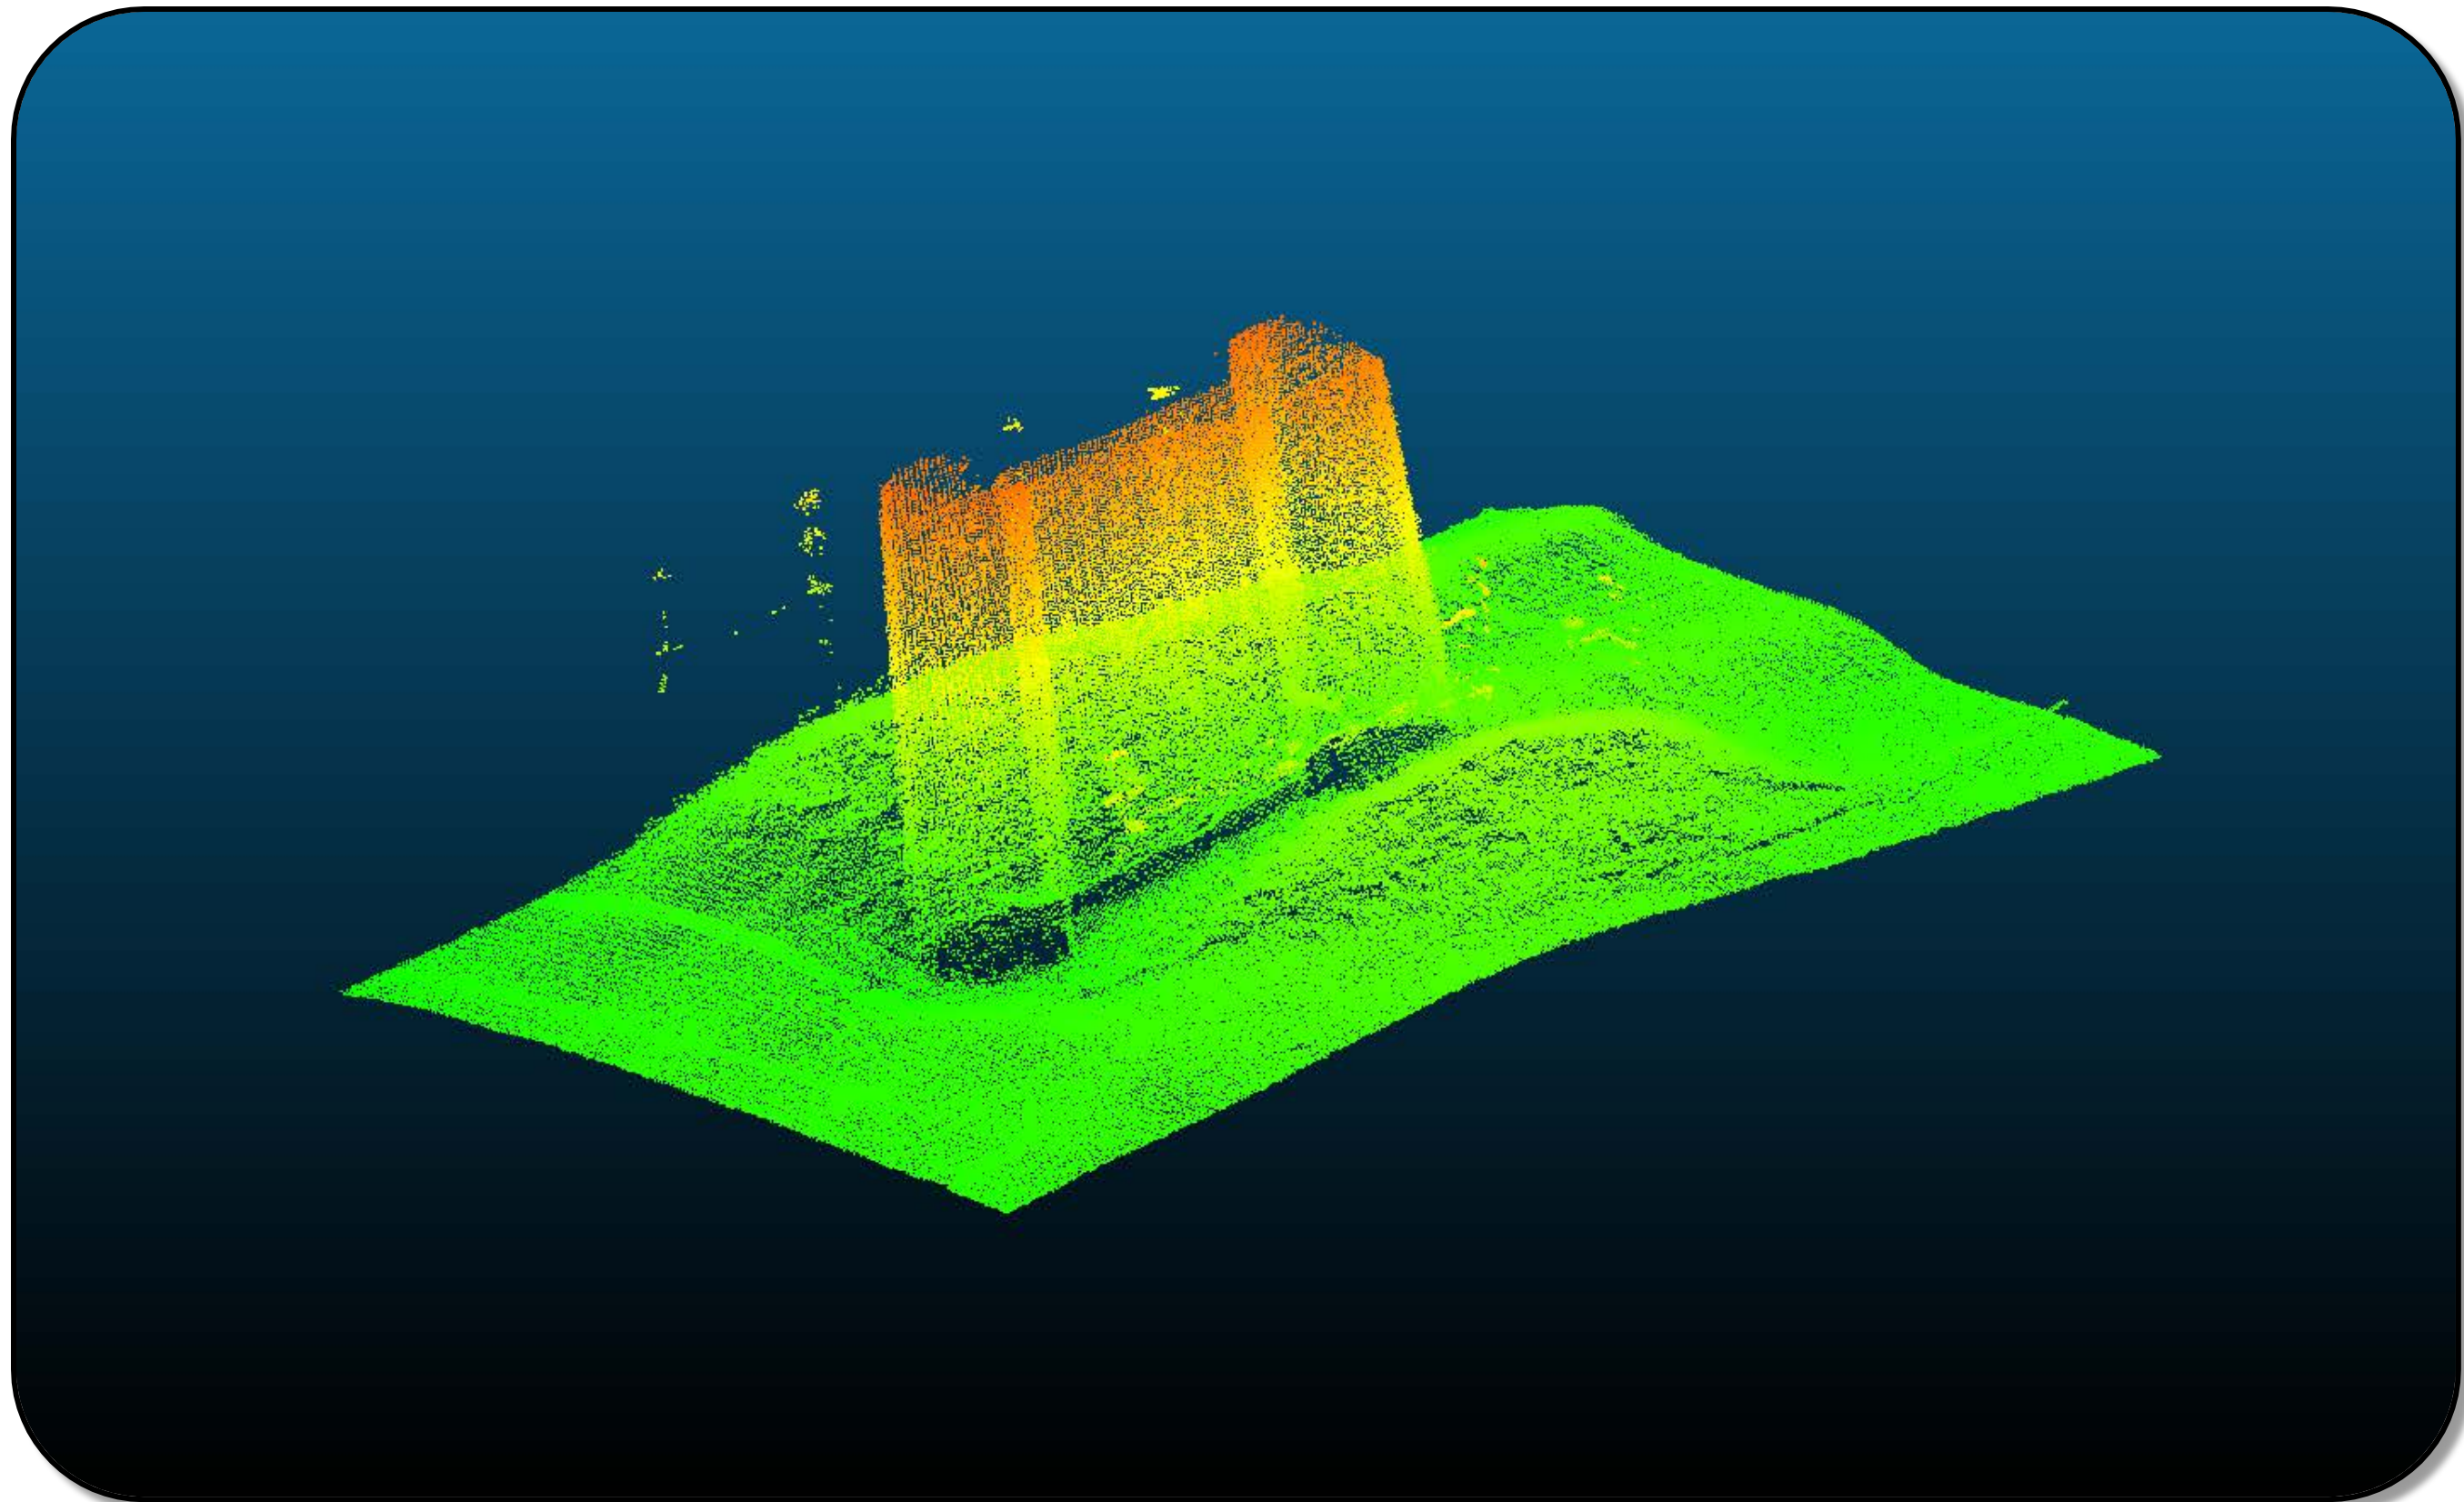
Perspective view of Pier 15 point cloud (looking from the northeast direction).
